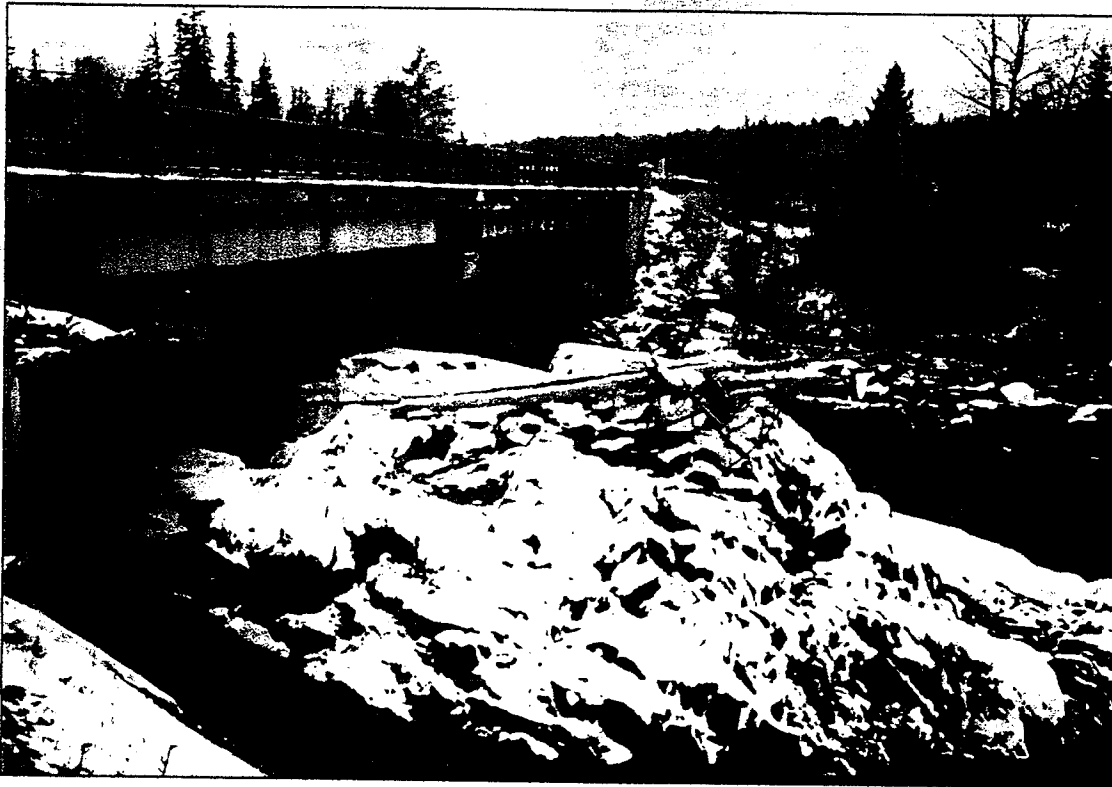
View from south of river east of bridge looking north. Note flat, steeply dipping rock face in foreground, irregular rock surface on island.
